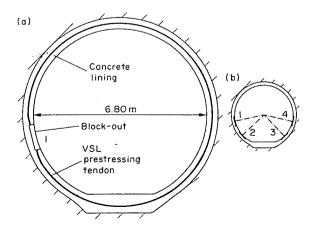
Prestressed concrete lining for a pressure tunnel: (a) layout of the tendon in position 1 and (b) positions of the tendon in subsequent sections
